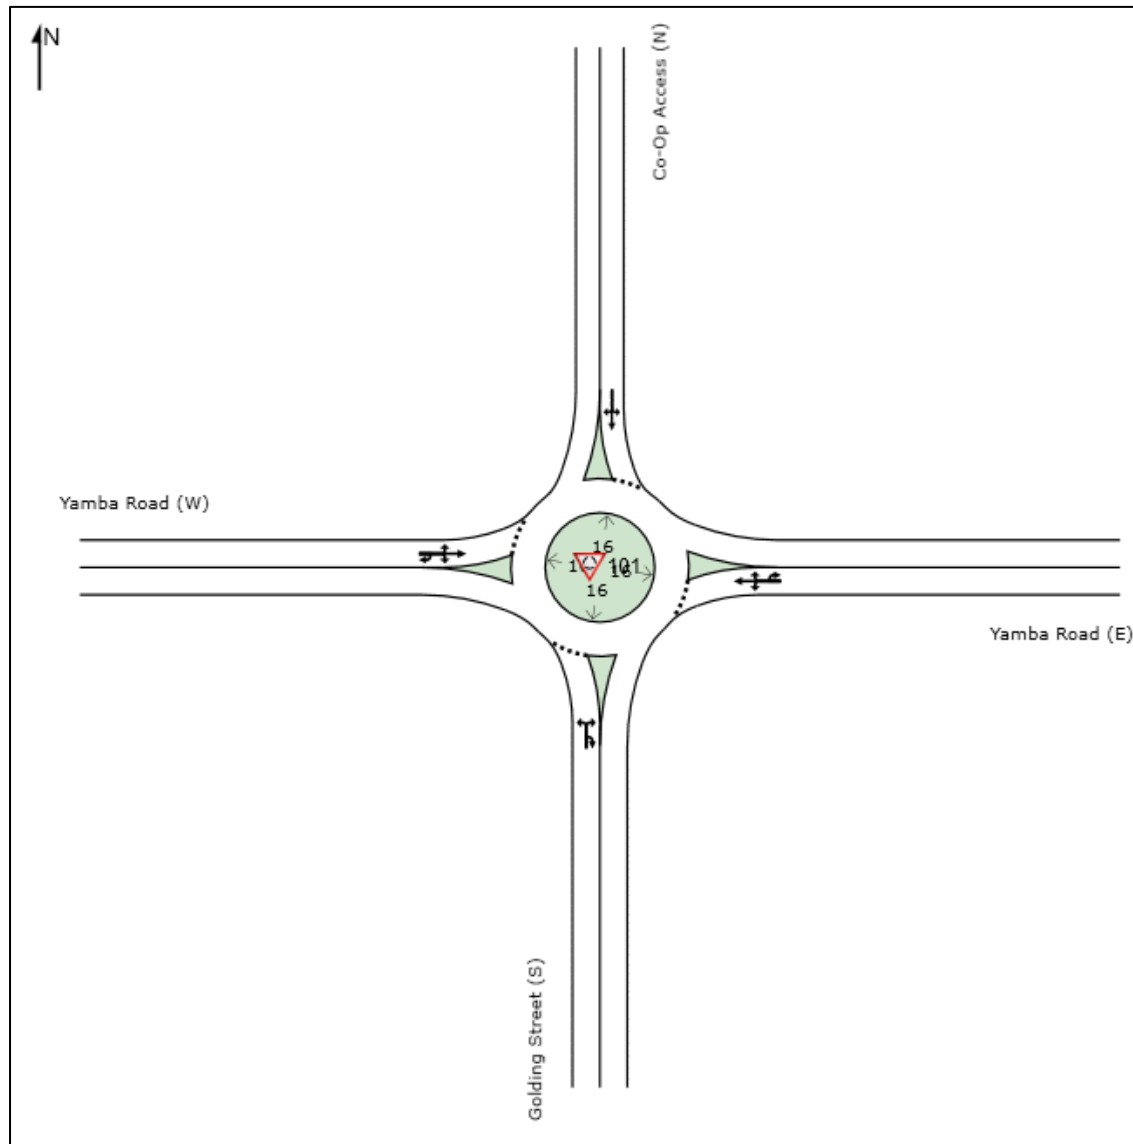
Yamba Road / Golding Street SIDRA Intersection Layout
